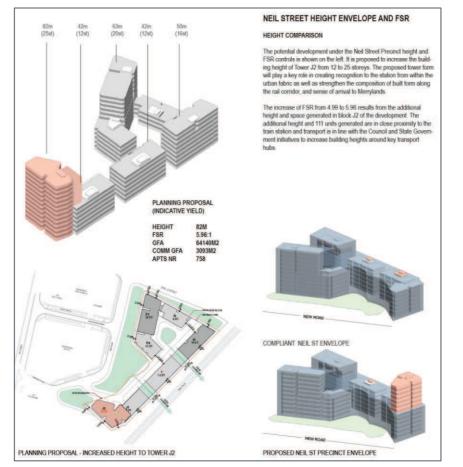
Basic development data for Building J12 and site Block D the subject of the Planning Proposal application
